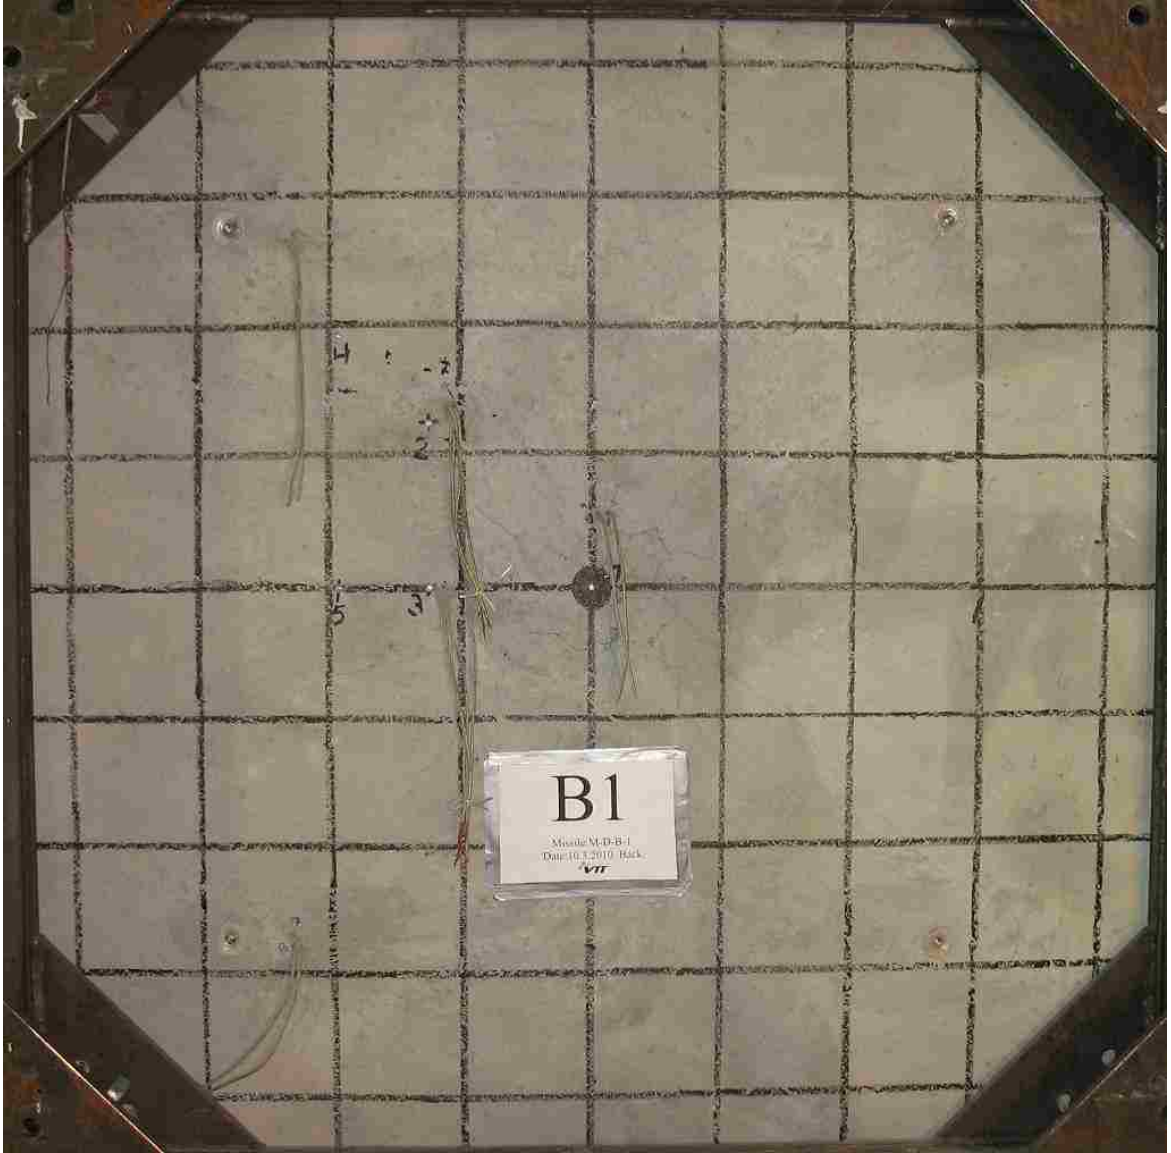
Concrete damage on rear surface of VTT experiment
